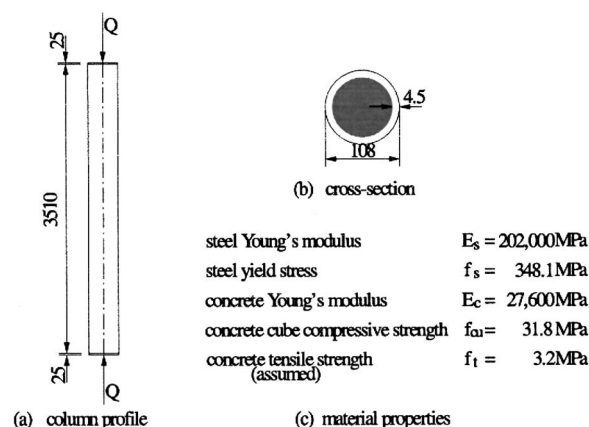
Concrete-filled circular hollow section column tested by Han (2000)
